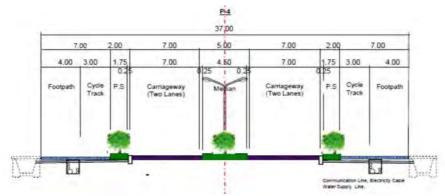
Proposed Typical Cross Section (Primary-4 Lanes)
